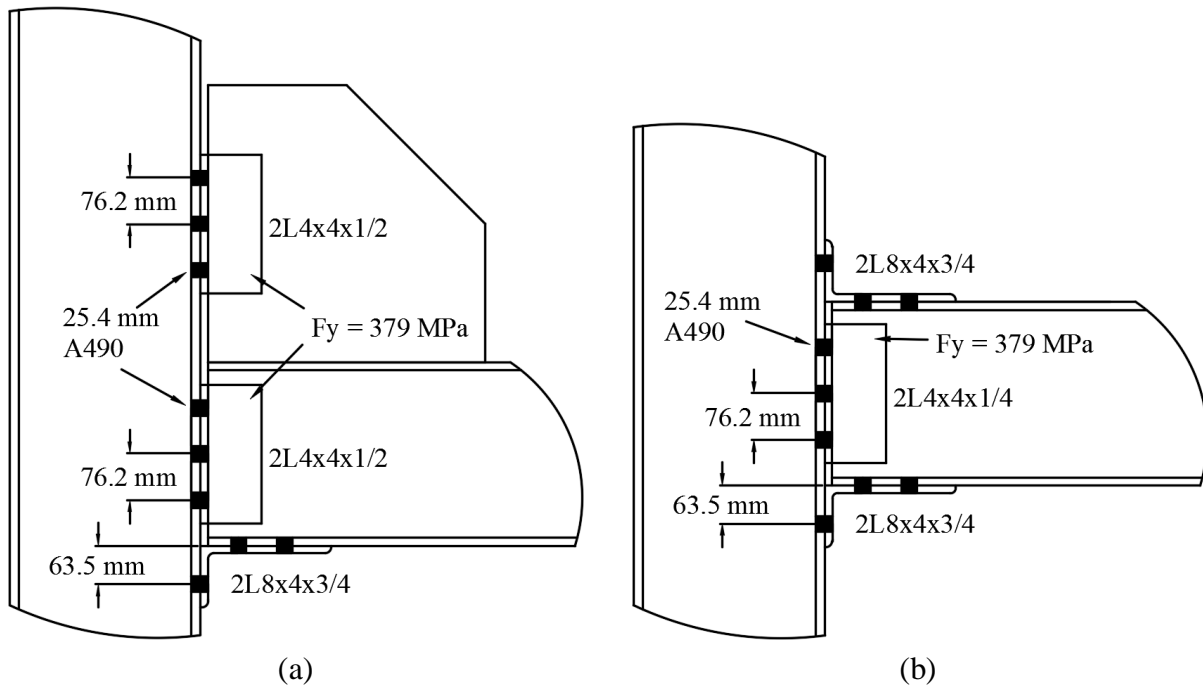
Typical enhanced connections used in prototype building model: (a) Enhanced CBF connection; and (b) Enhanced gravity connection.
